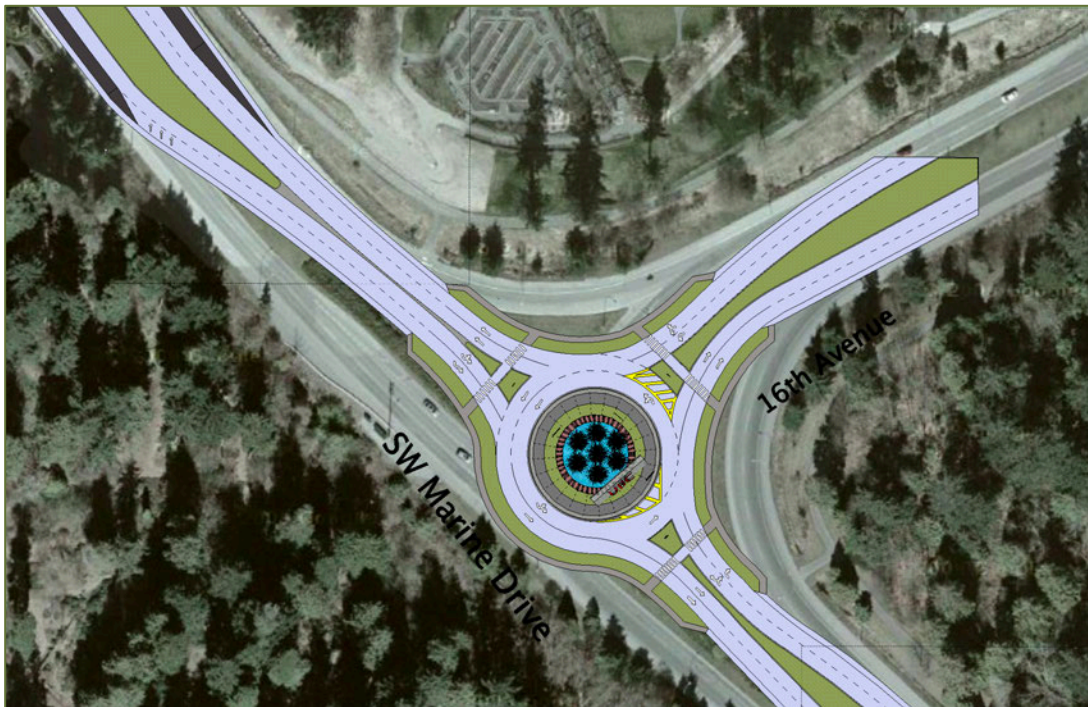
Proposed Roundabout Layout at 16th Avenue & SW Marine Drive
